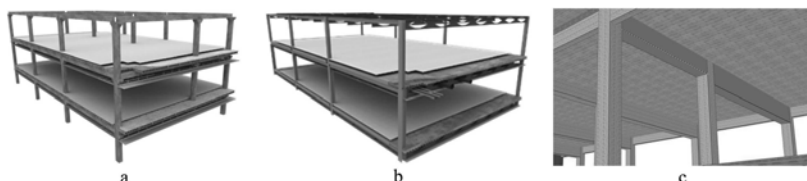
Structural options: a. Reinforced concrete; b. Composite; c. Timber.
